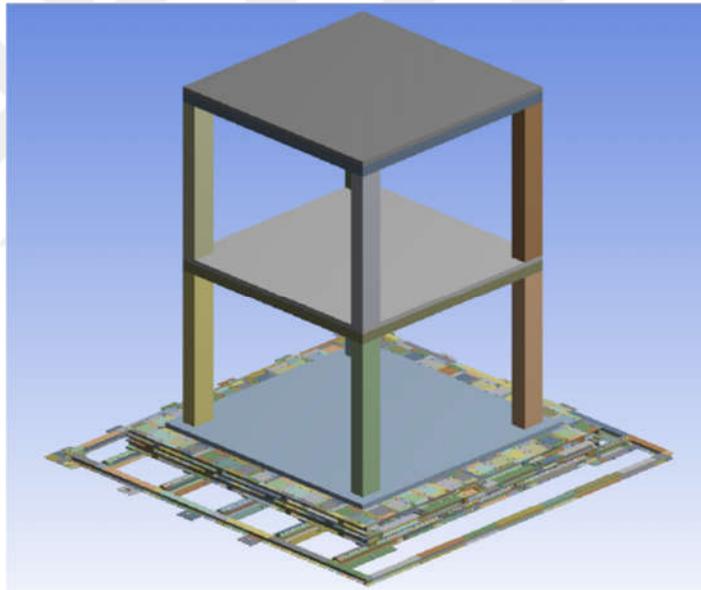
Geometry of model of two story-single bay R.C building on shaking table
